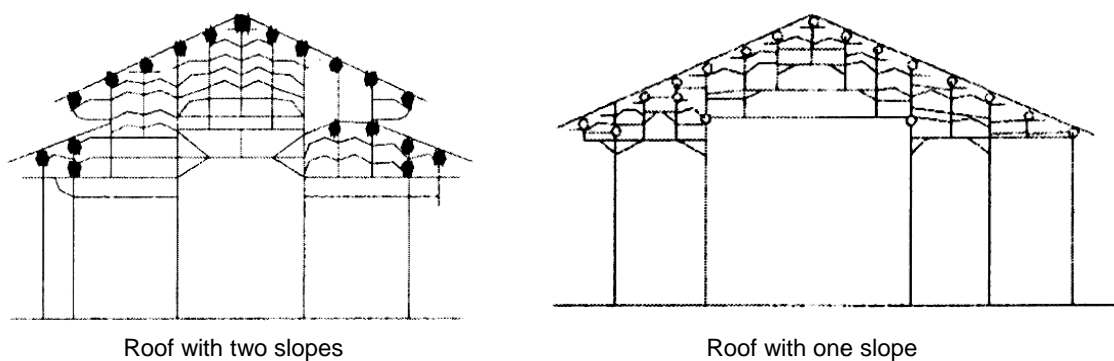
Different roof layout in Dieh-Dou buildings (Huang, et al, 2003)
